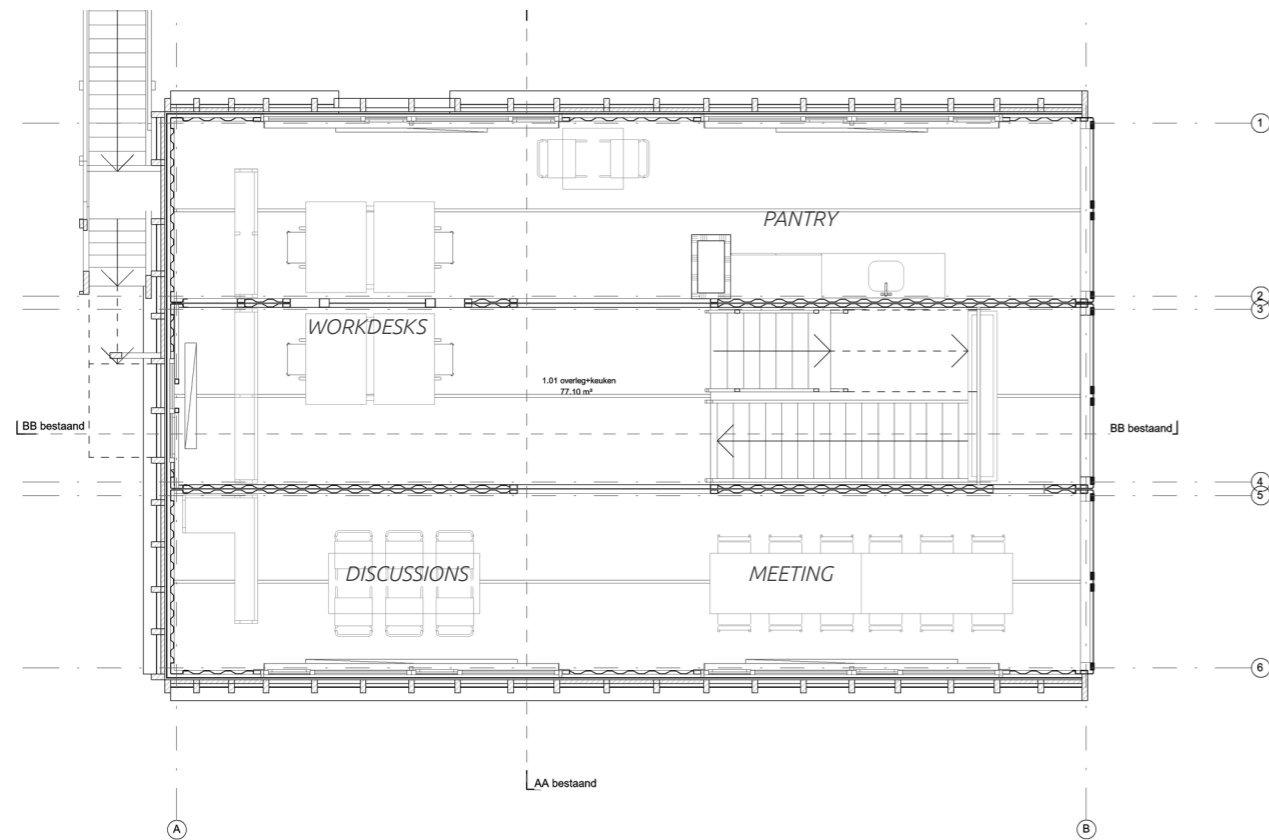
First-floor plan. (Courtesy - DOOR Architects) (Not to scale)
